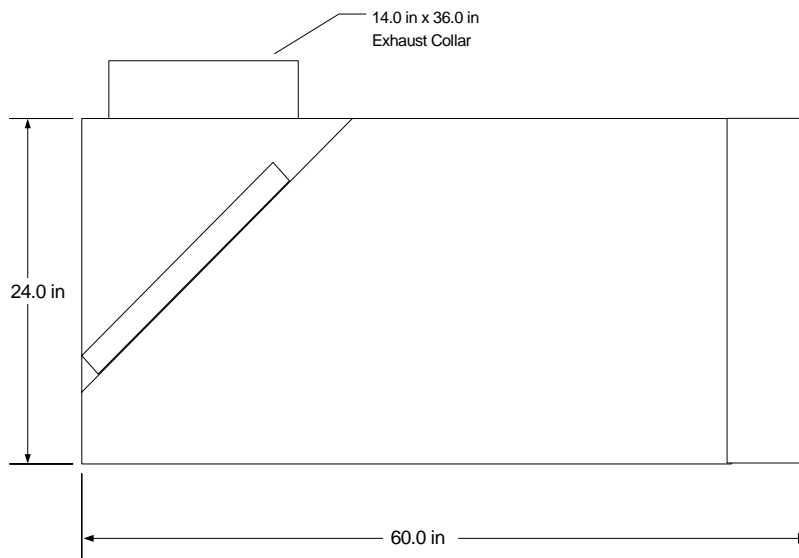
Cross Section Drawing of Hood with 1 foot Hood Depth Modification Installed
